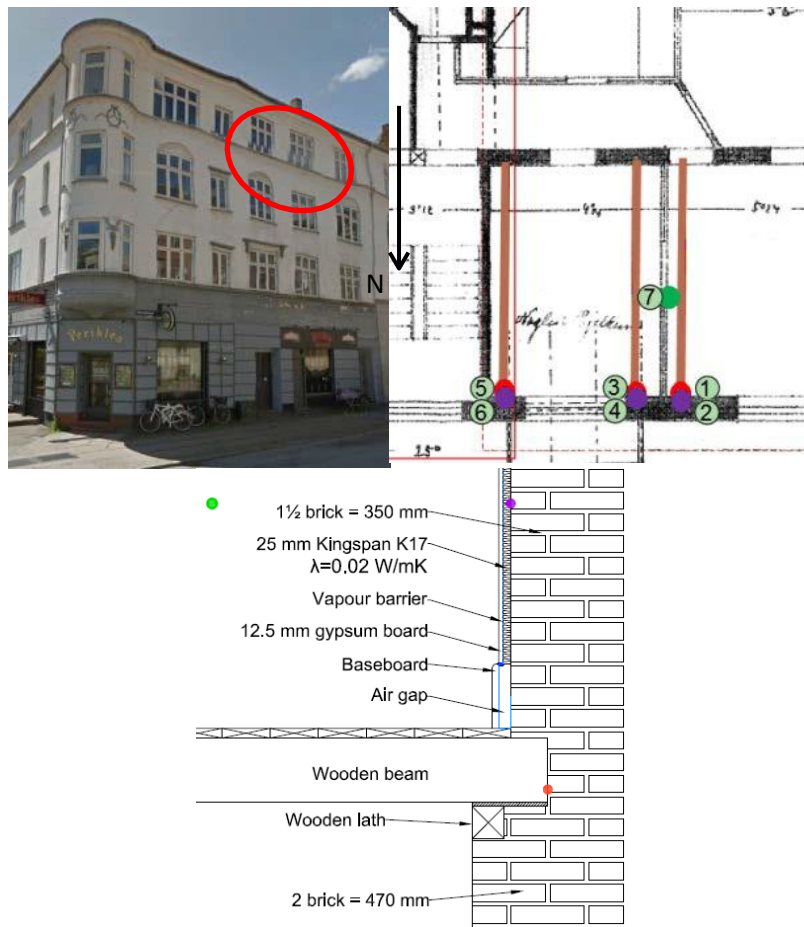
Kildevældsgade and indication of wall placement (left), sensor placement on floor plan (middle) and construction with sensor placement (right)
